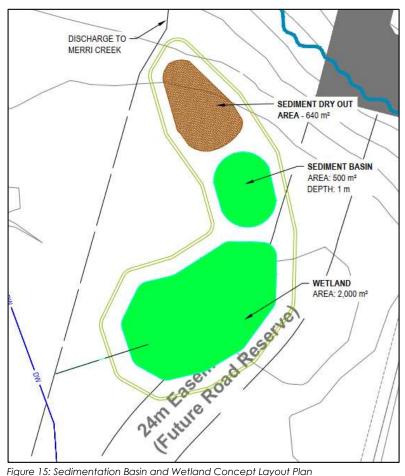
Sedimentation Basin and Wetland Concept Layout Plan
